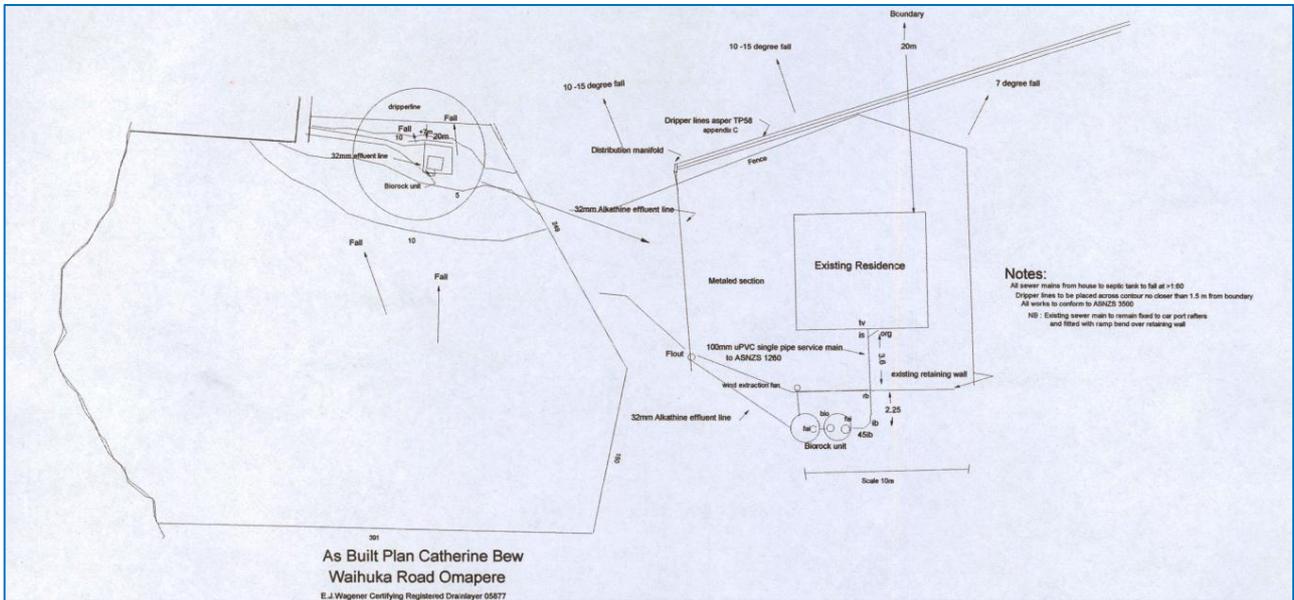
As built plan of Onsite Wastewater Treatment and Disposal Area (Source: FNDC Property File, BC-2019-415-1 Plans).
